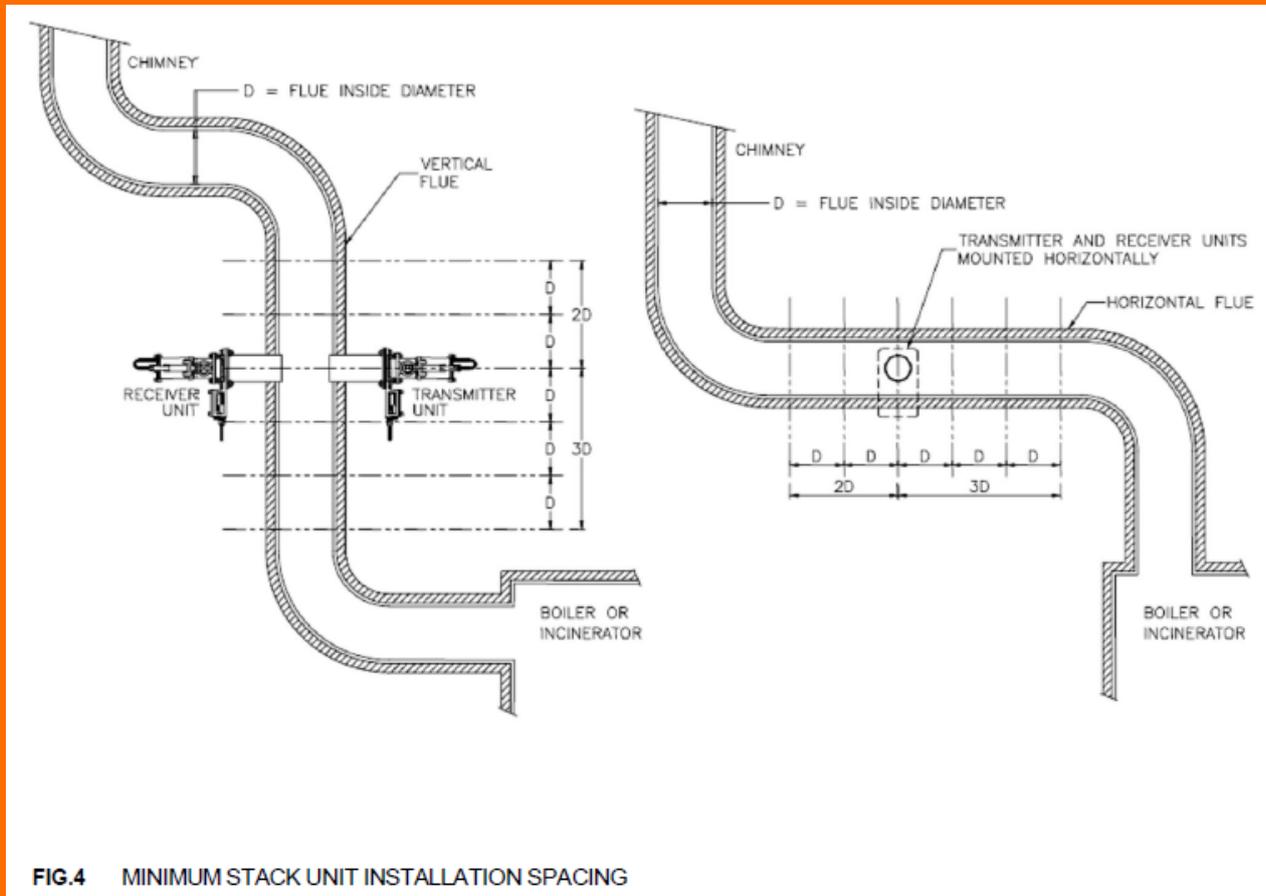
MINIMUM STACK UNIT INSTALLATION SPACING
